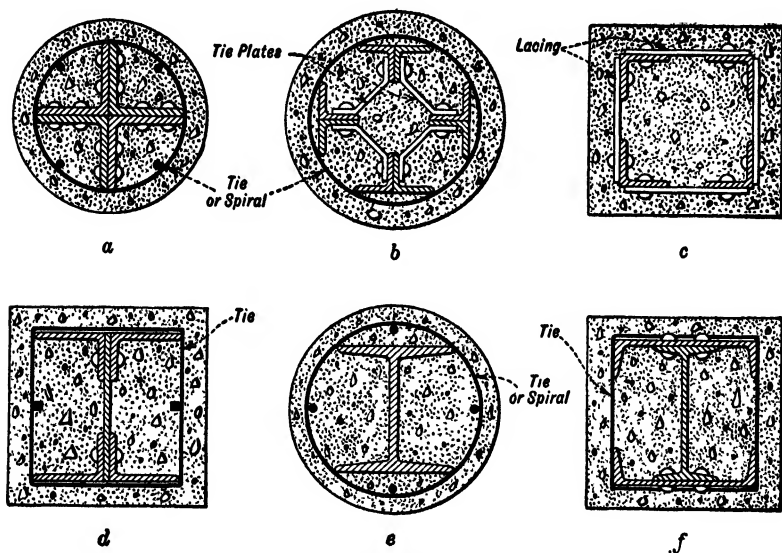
Structural Steel Columns Encased in Concrete. (See p. 440.)
